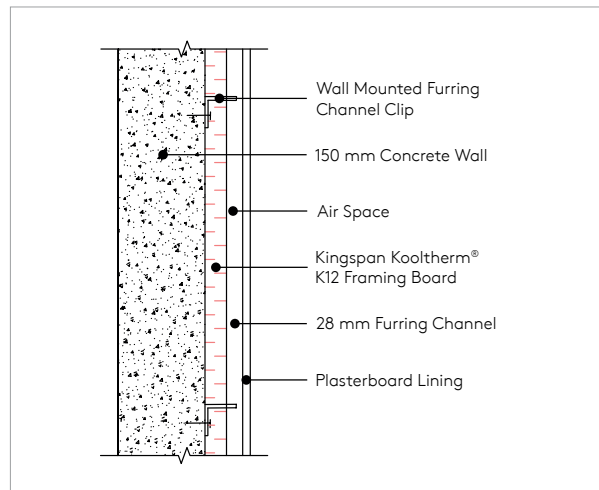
Side elevation of Kingspan Kooltherm® K12 Framing Board clip-and-channel system.
